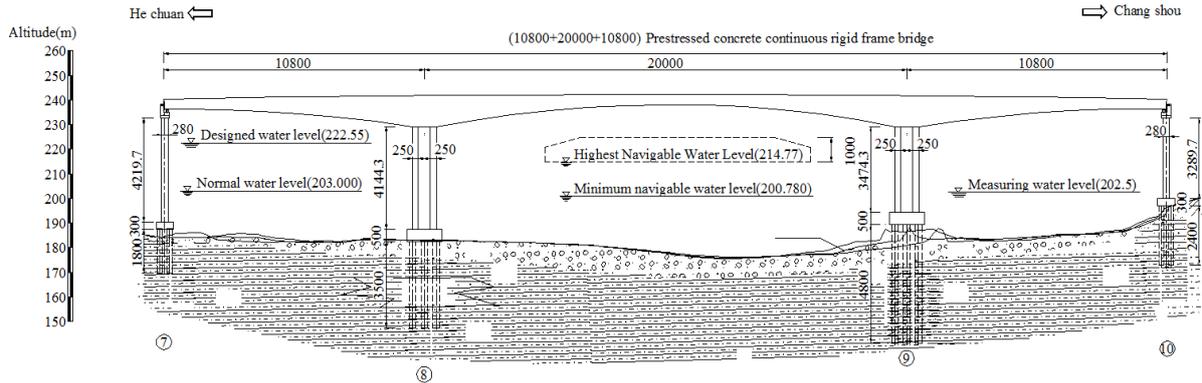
Layout of Main Bridge of Jialing River Bridge in Longxi
